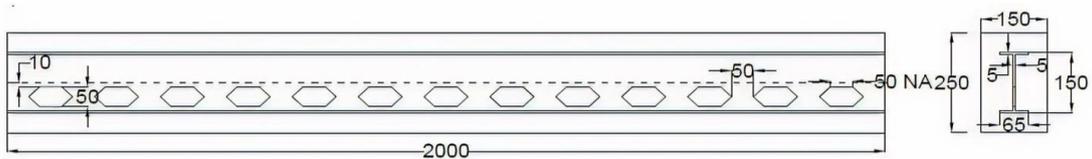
Concrete encased steel castellated beam opening below NA (CESB- H3)
